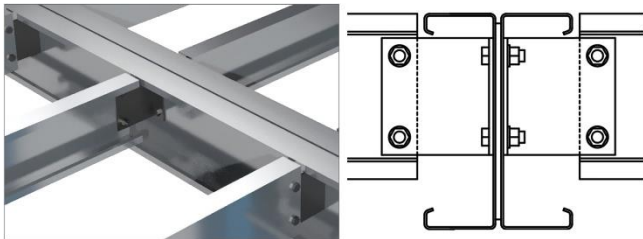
Detail of the floor beams connection (different profile depth of primary and secondary beams) [1]
